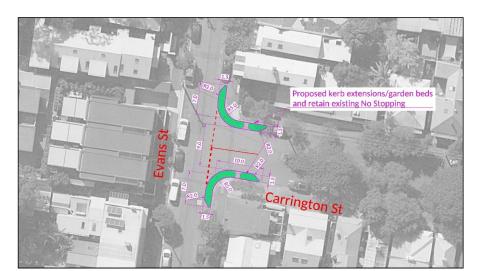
Evans Street / Carrington Street intersection proposal.
